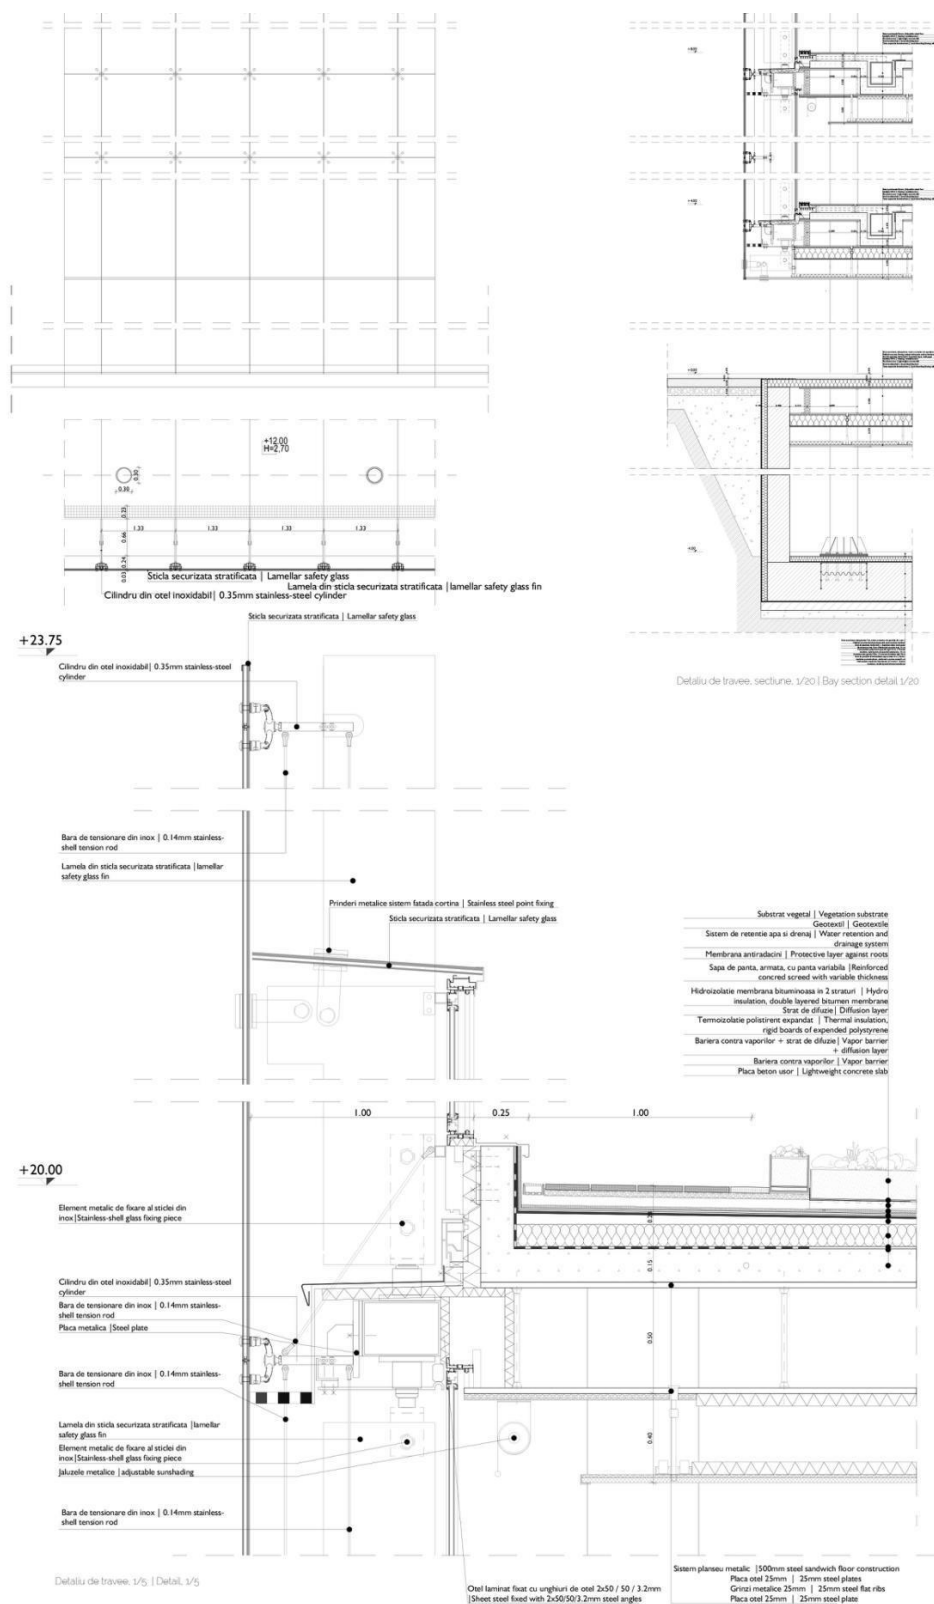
Biotech CUBE. Technical details in cross section and facade © Iulia Muraru.
